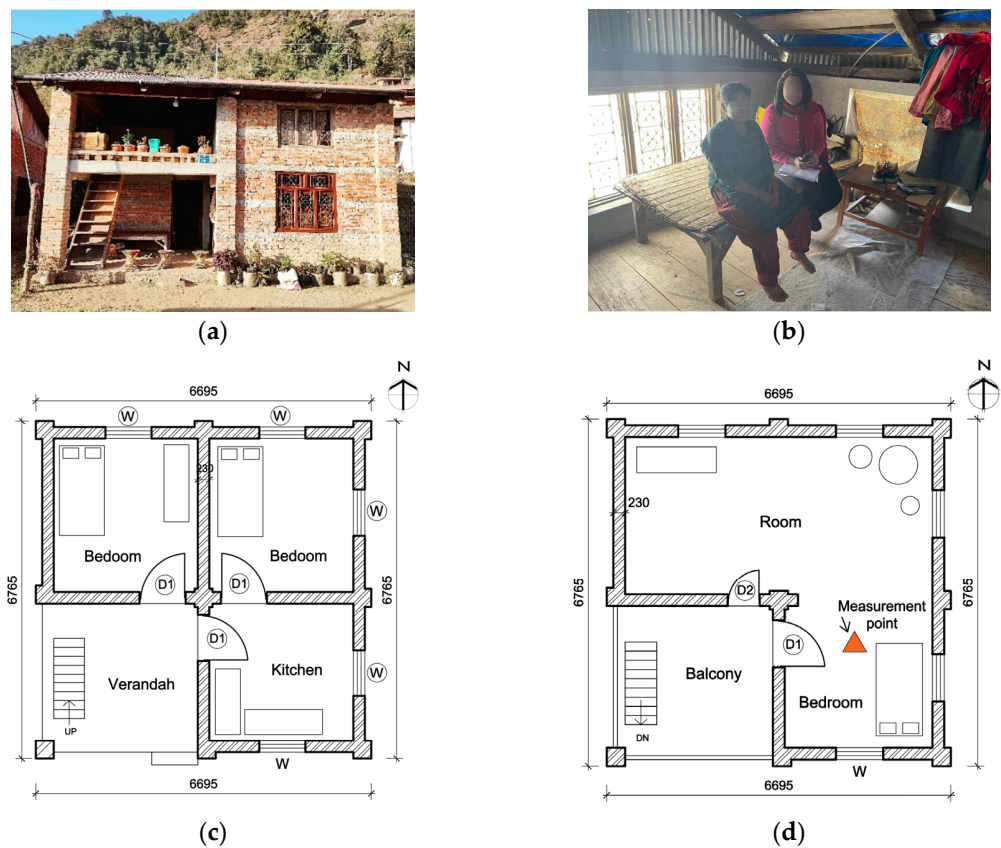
Exterior view, interior space of prototype house in Panipokhari: (a) Exterior view; (b) Interior spaces; (c) Ground floor plan; (d) First-floor plan.
